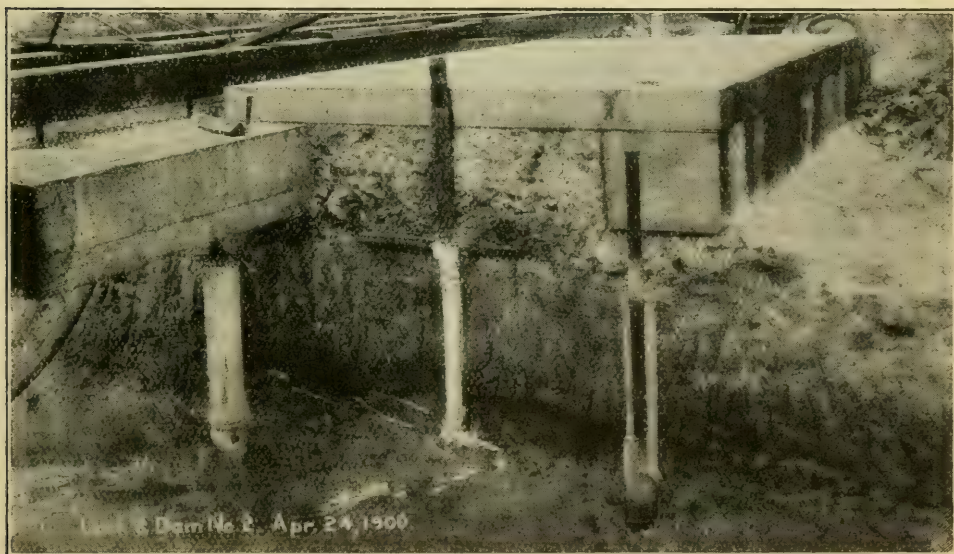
EXPERIMENTAL SECTION OF CUT-OFF WALL, PARTLY EXCAVATED, TO DETERMINE WHETHER THE GROUT FILLED ALL CREVICES, ETC.
